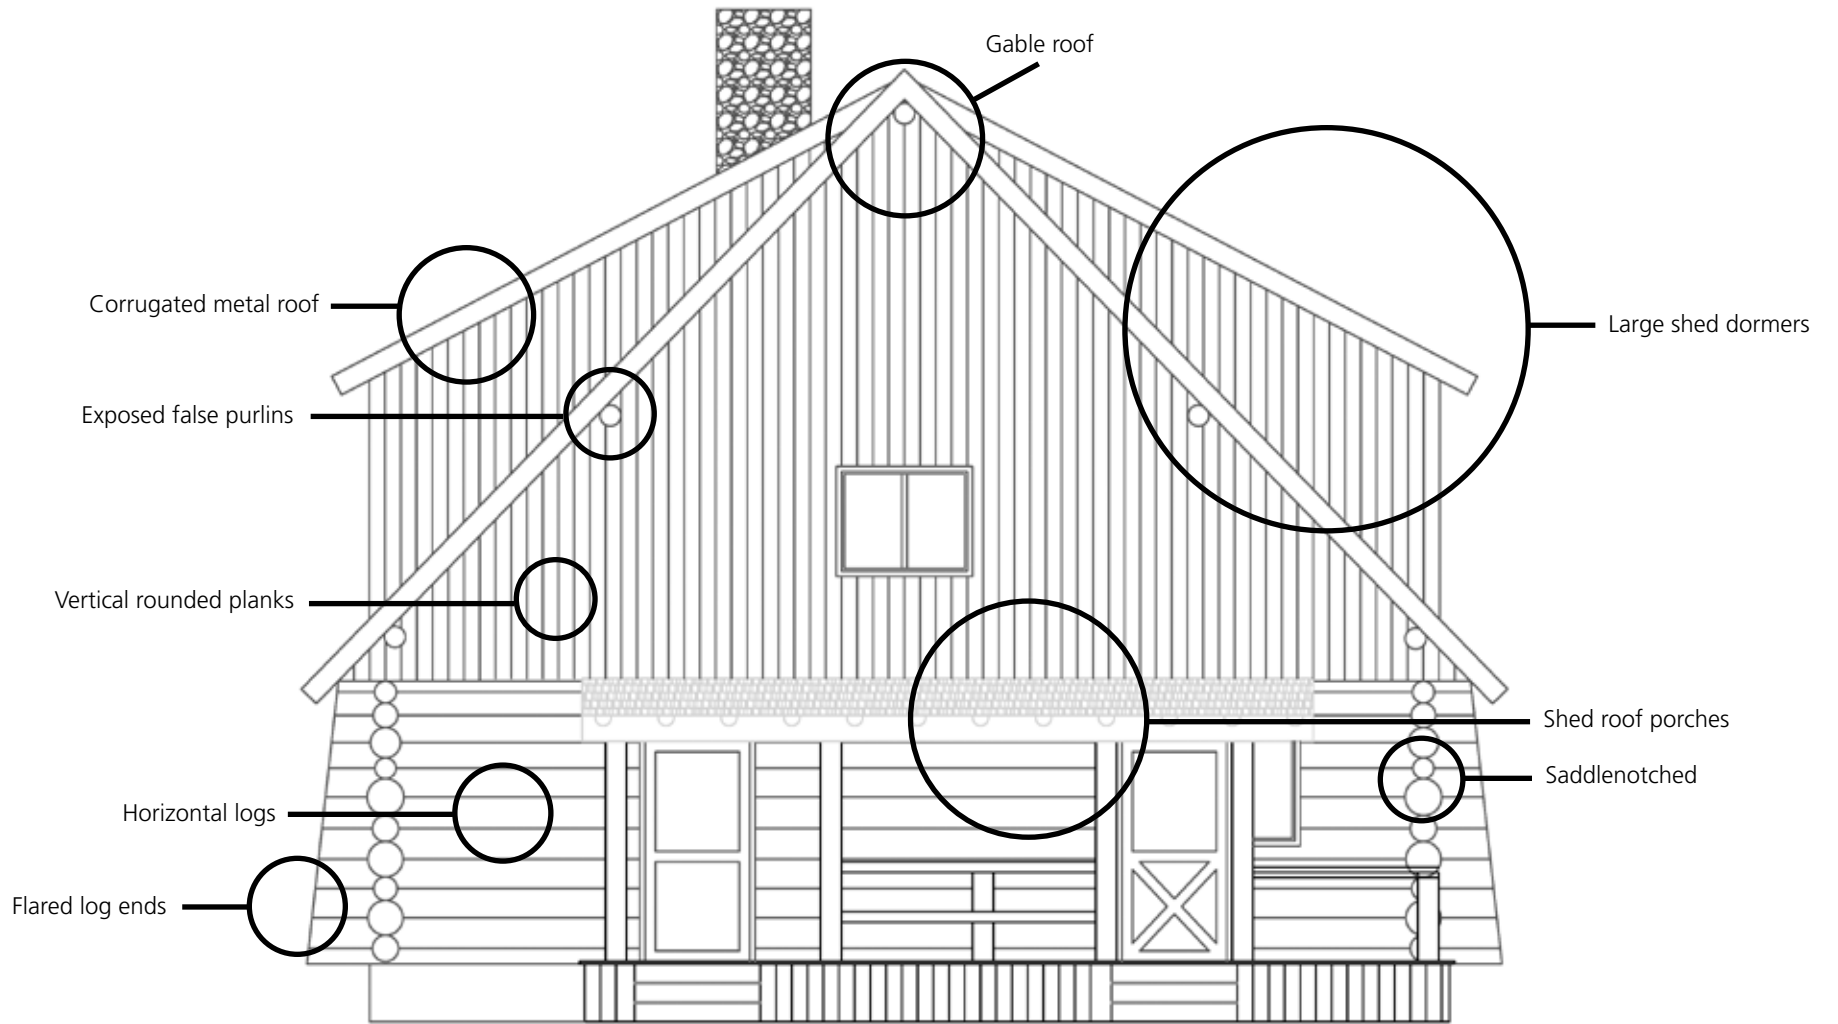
Building 21, West Elevation, 2012 (NPS Alaska Regional Office files)
